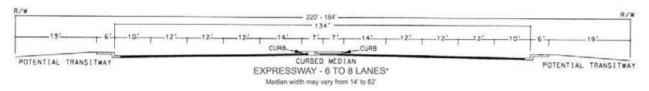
Riverside County Typical Arterial Highway Typical Cross-Section
